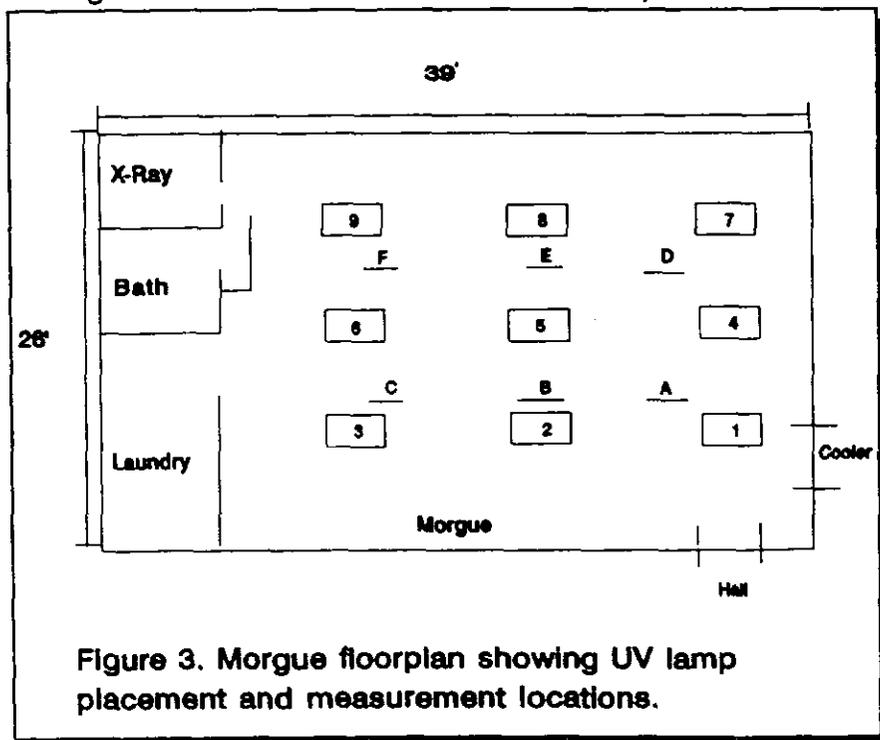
Morgue floorplan showing UV lamp placement and measurement locations.
